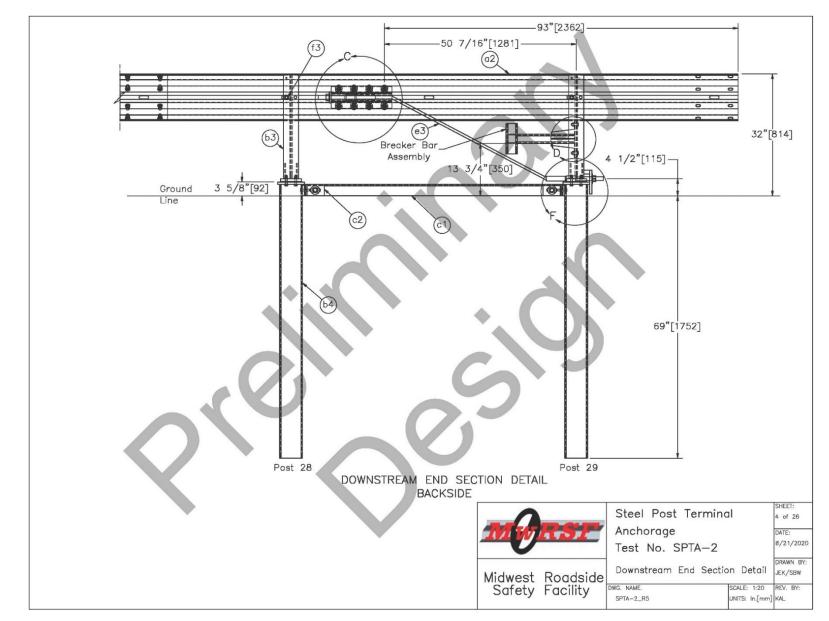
Downstream End Section Detail, Test No. SPTA-2
